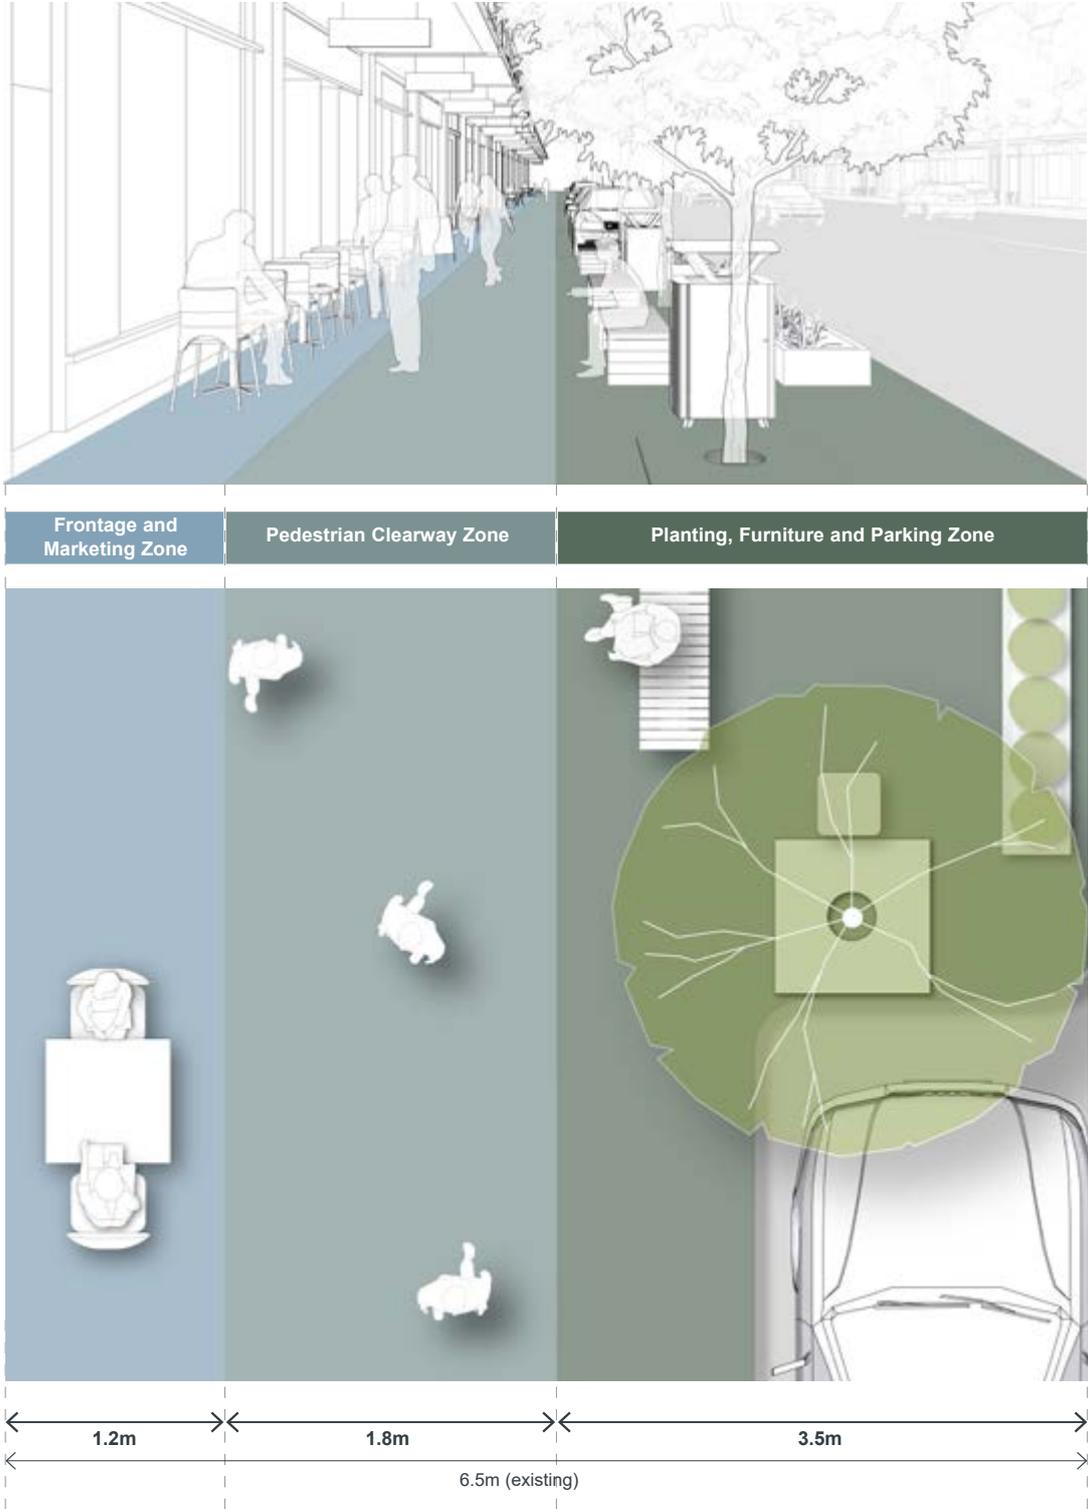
Indicative desired footpath zones along Bong Bong Street (in perspective section and plan view)
